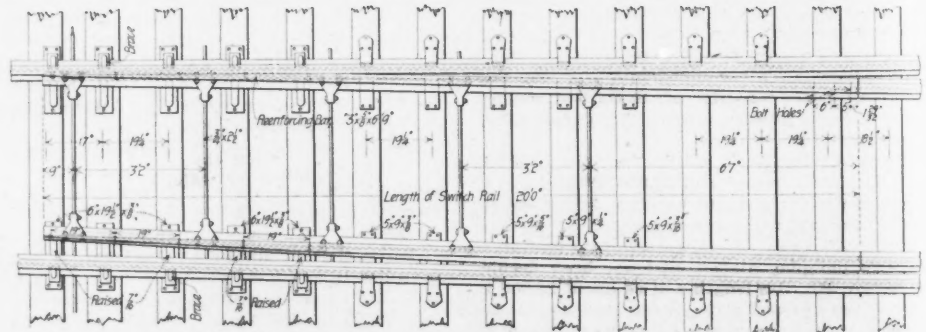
SWITCH WITH 100-LB. RAILS; DULUTH & IRON RANGE R. R. R. Angst, Chief Engineer.
